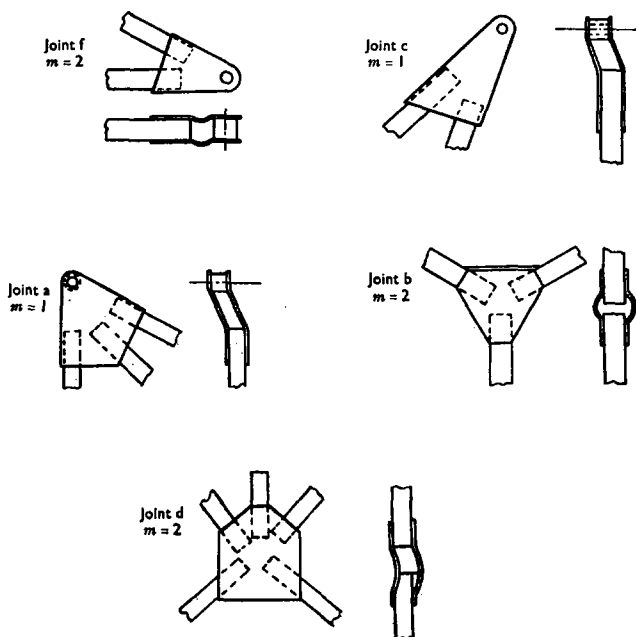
FAILURE MODES OF GUSSET PLATES
